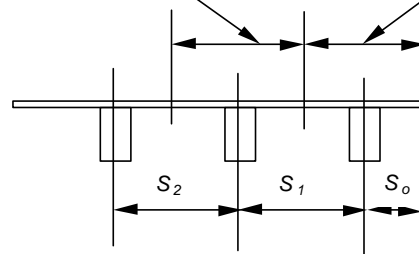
Girder Spacing and Full Flange Width.
